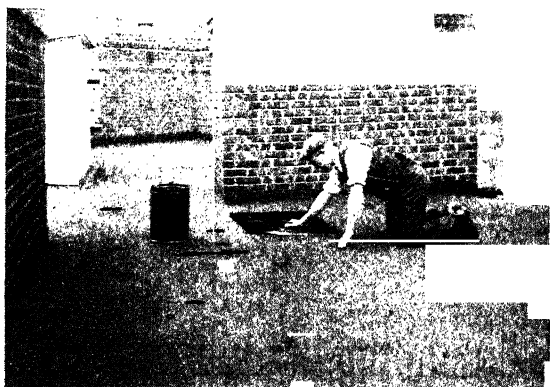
B.—REPAIRING CRACKS IN ASPHALT ROOF WITH “PLASTALEKE” (George M. Callender & Co., Ltd.)
